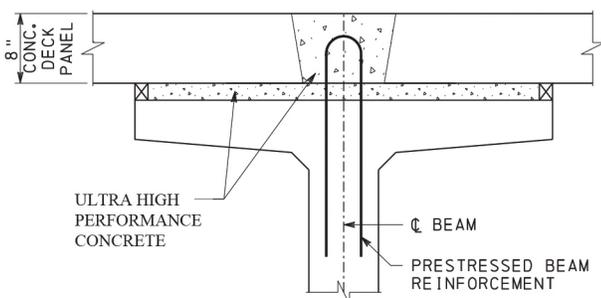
Precast Concrete Deck Panel to Beam Connection Detail
